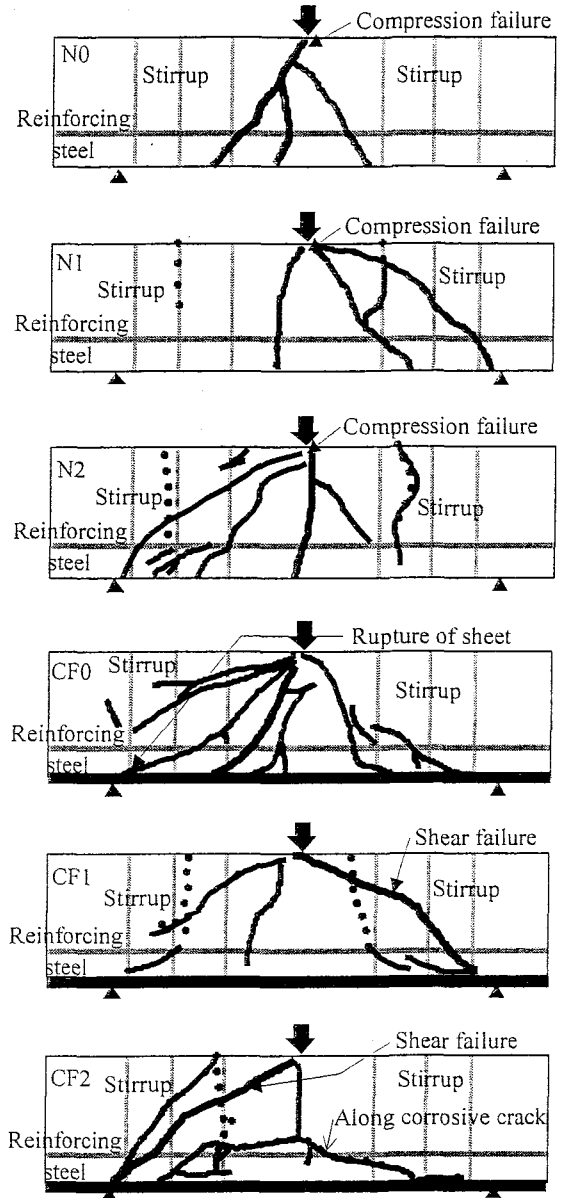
Crack pattern. (Dotted line: Crack due to rebar corrosion before loading)
